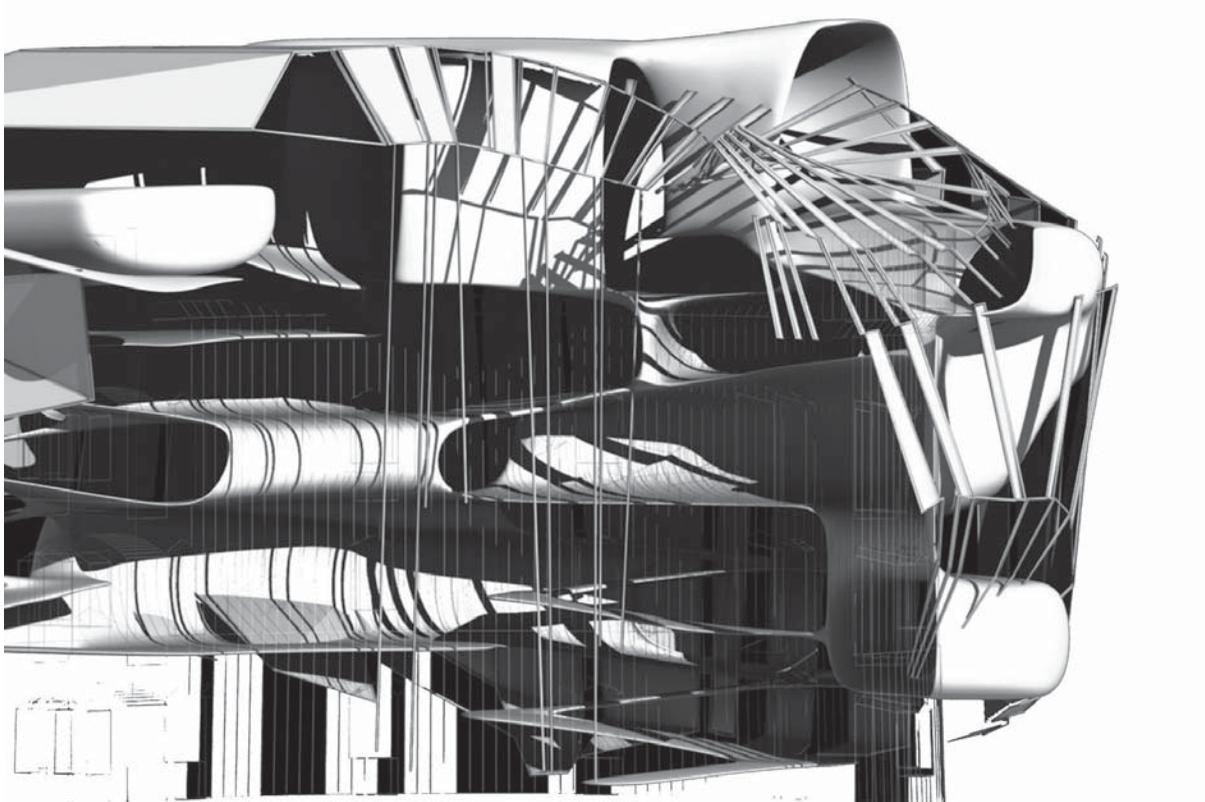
NCCA Kaliningrad_RU—Design Project of Natalja Kopycko, elevation of the Kronprinz Tower and the new Art Center parasite
